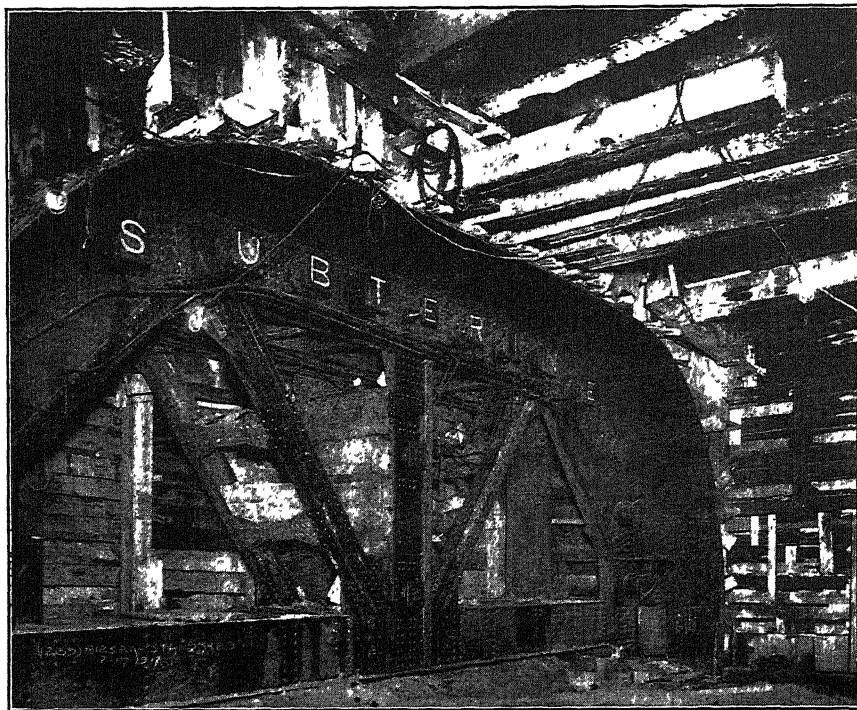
ROOF SHIELD STARTING FROM SHAFT.
